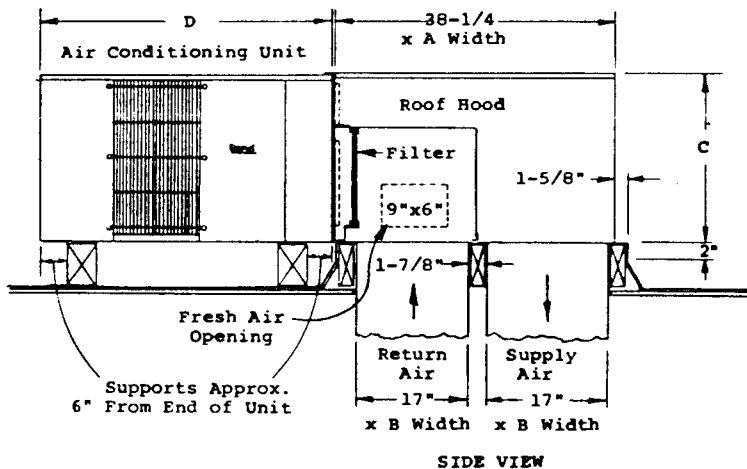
UNIT AND ROOF HOOD DETAILS
